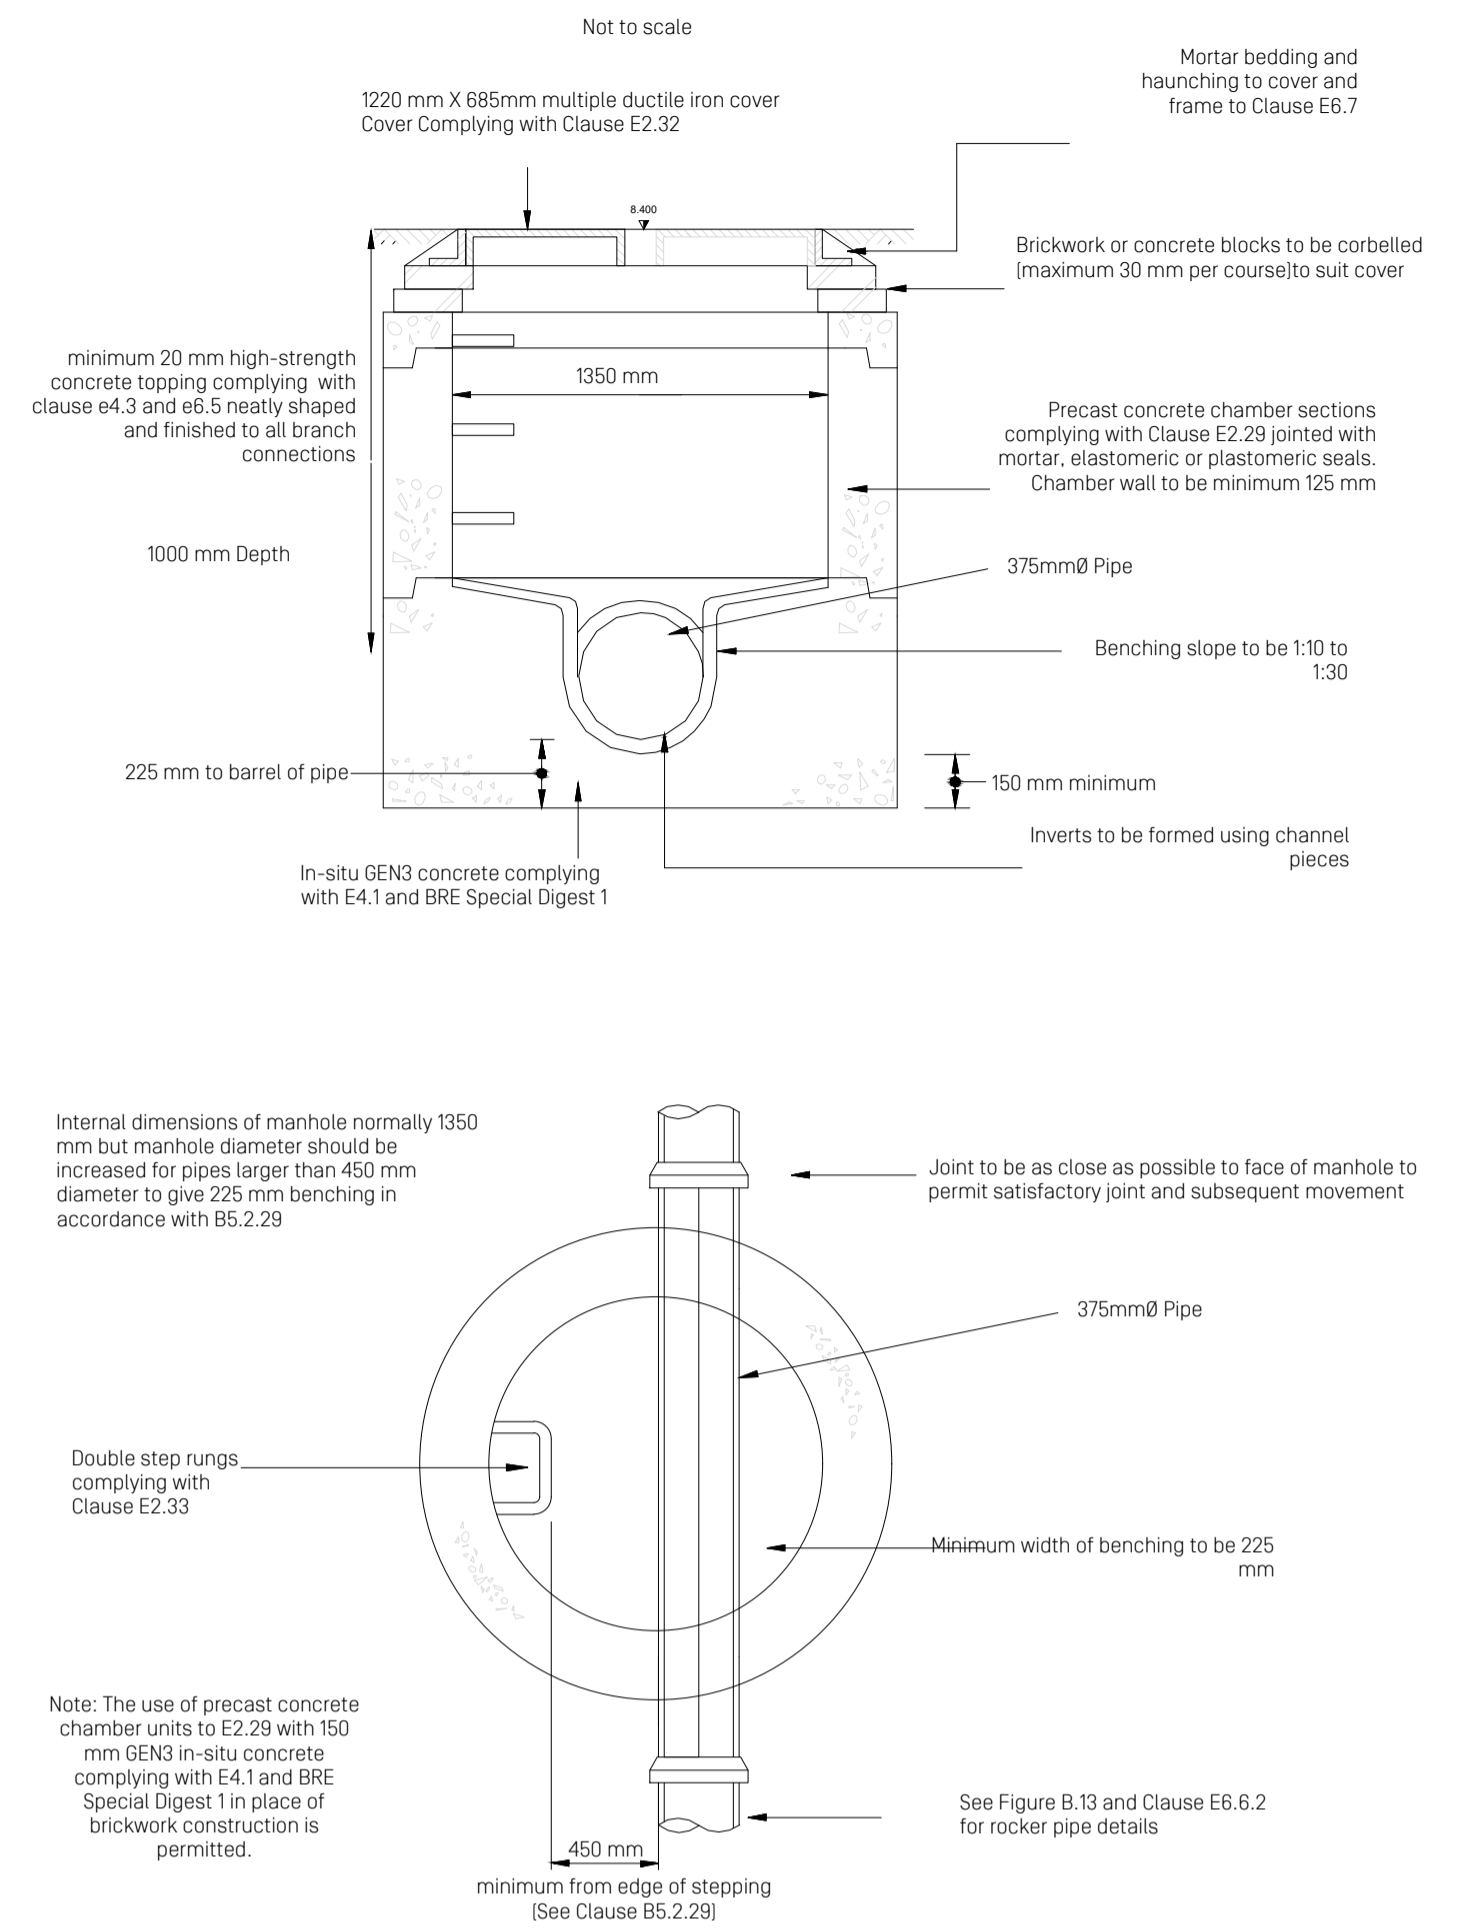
TYPICAL MANHOLE DETAIL - TYPE C
